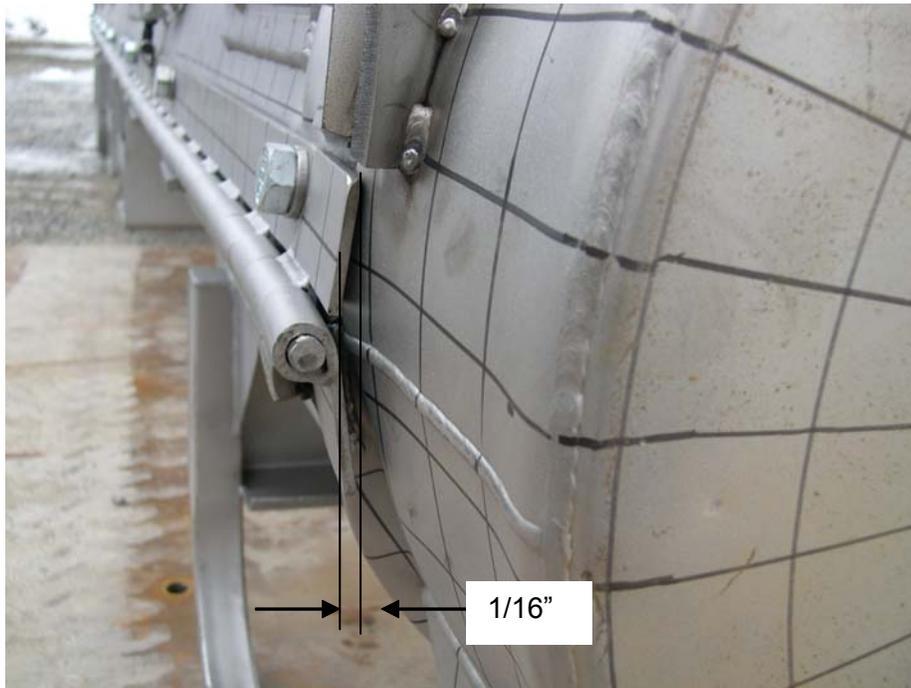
Hinge Separation at Bottom Nozzle End From Test 2
